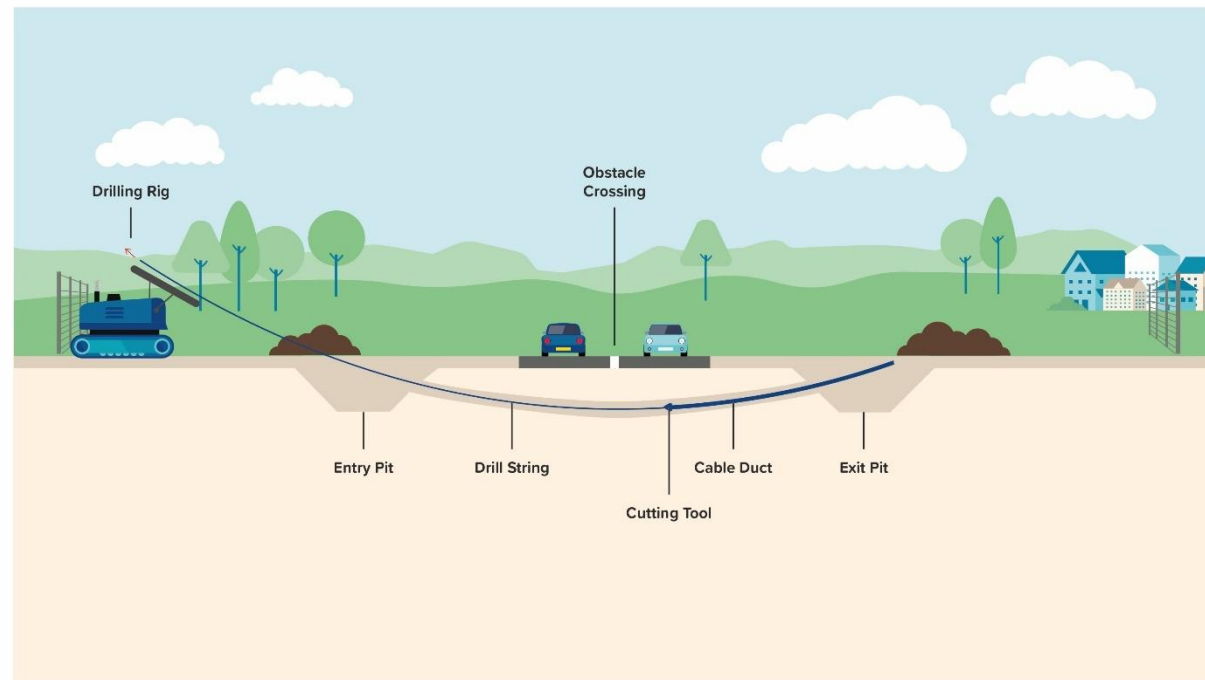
Indicative Cross-Section of Trenchless Duct Installation (Showing HDD, anticipated to be the most common technique for trenchless obstacle crossings.)
